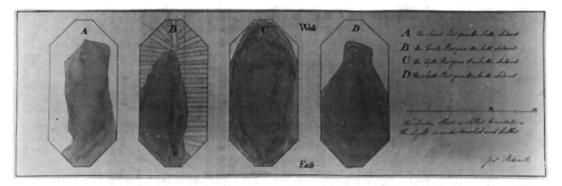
Pickernell's plans of the underwashed piers 1778. The dark areas are those remaining in contact with the ground, the white areas are underwashed
